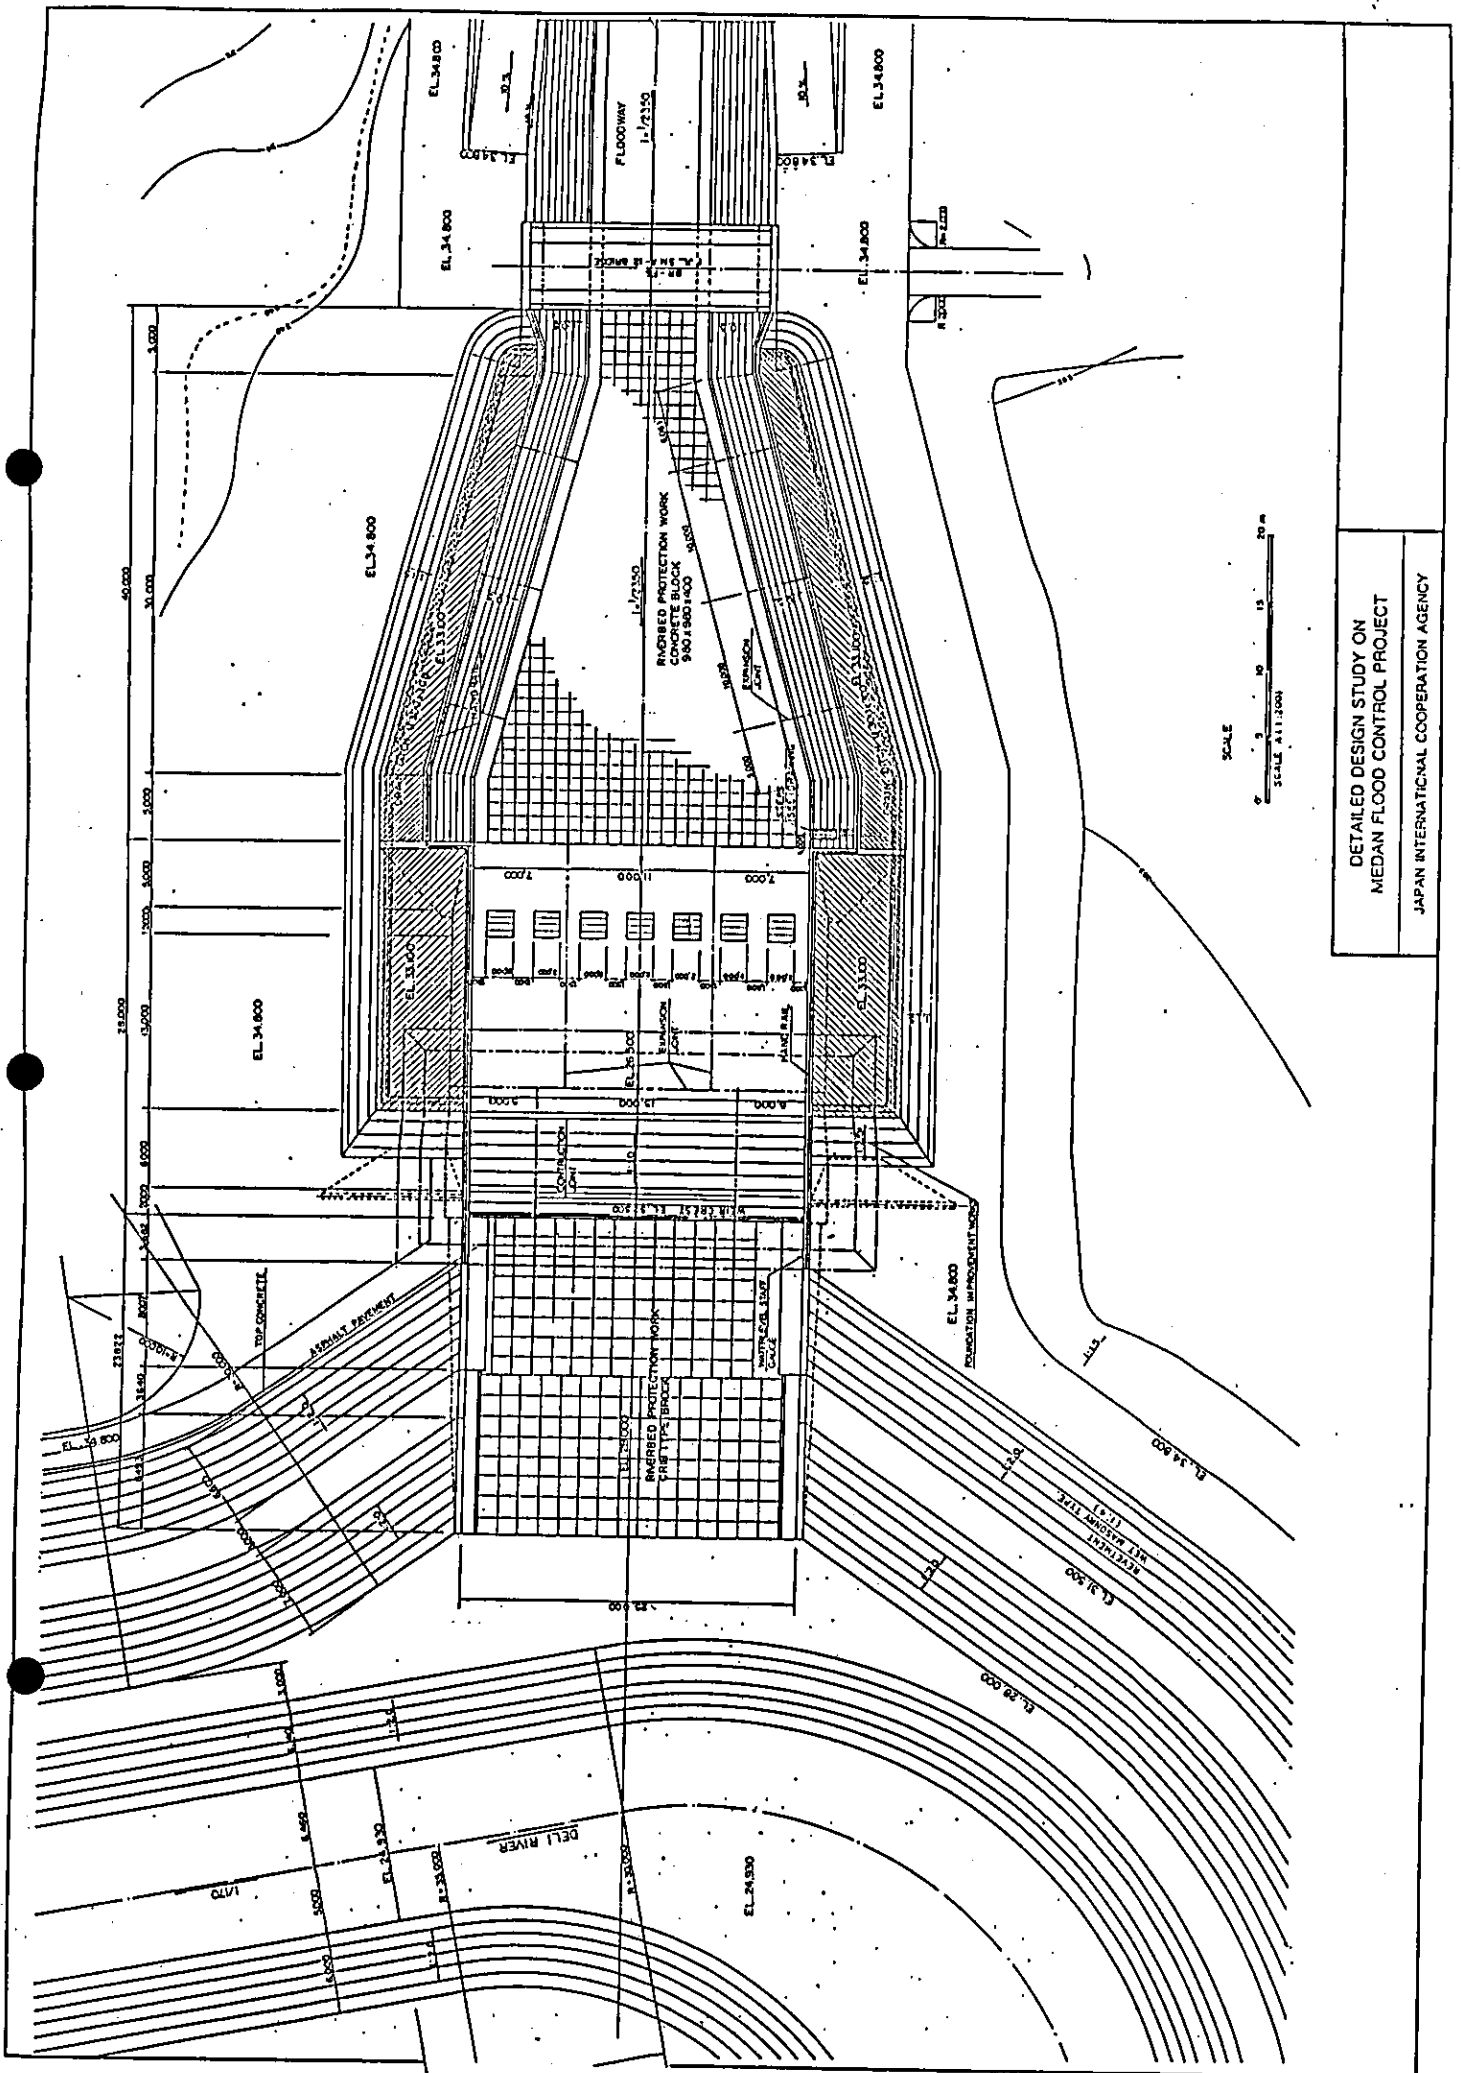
(1/2) FLOODWAY WEIR, PLAN
